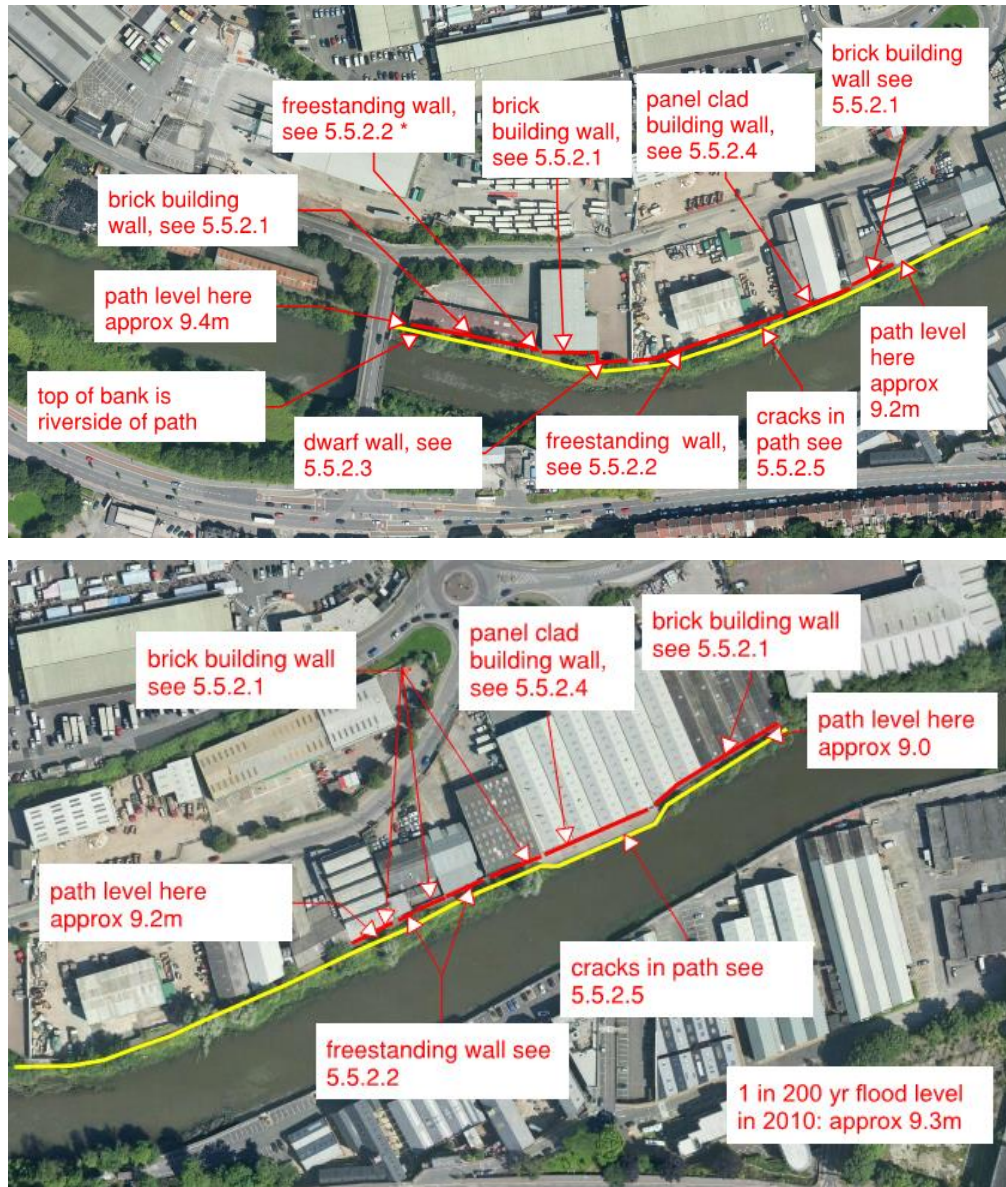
Walls from Albert Road bridge to Travis Perkins building, aerial image © Blom 2012
